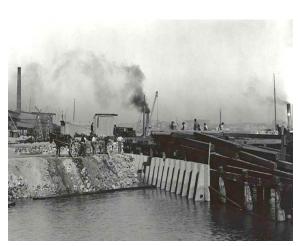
Design of timber sheet piling seawall faced with Monier concrete plates.⁴³
